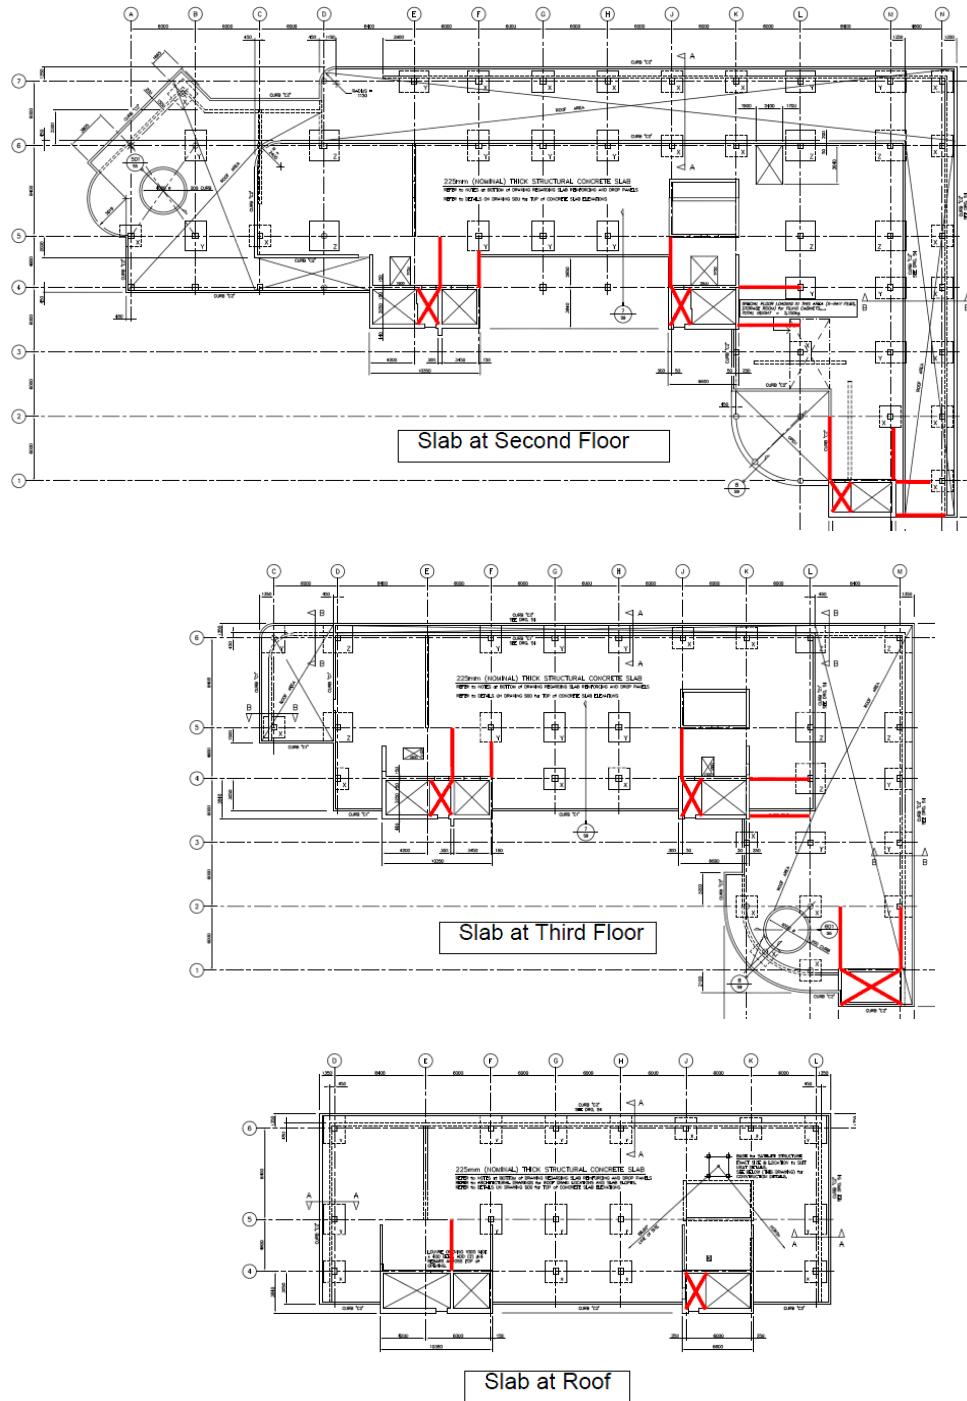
The layouts of recommended steel plate floor trusses (Continued)
